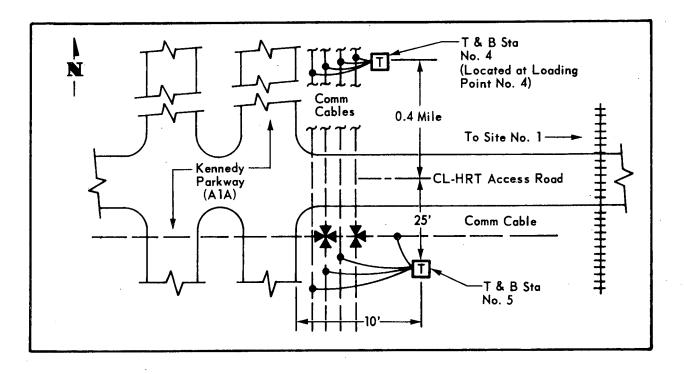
Test and Bond Stations No. 4 and 5 Equipment Locator
